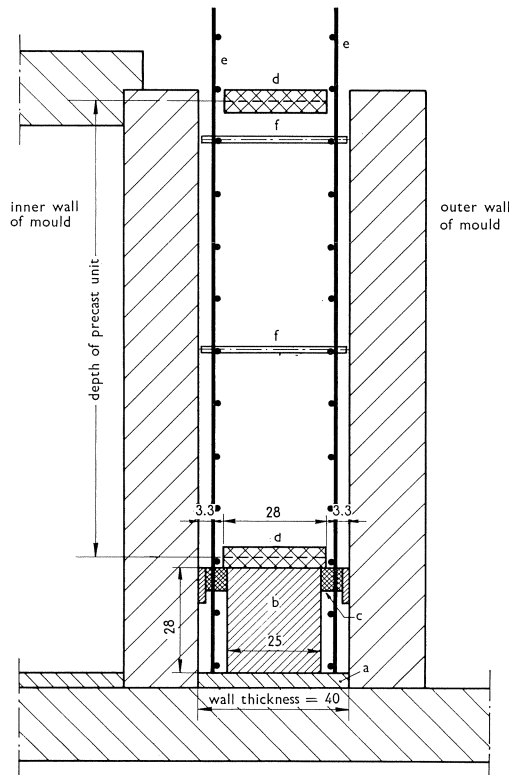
Cross-section through the formwork for an external wall (dimensions in mm).
